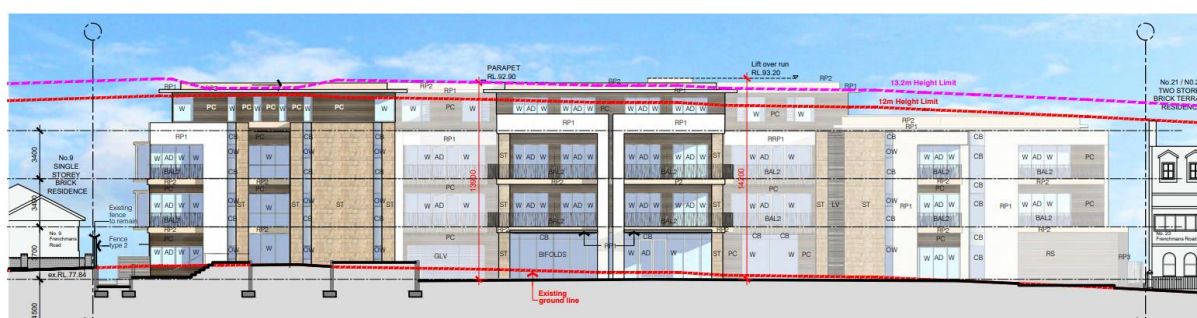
South Elevation (Frenchmans Road frontage) Dwg No. DA13, Rev C dated 15 July 2021.
